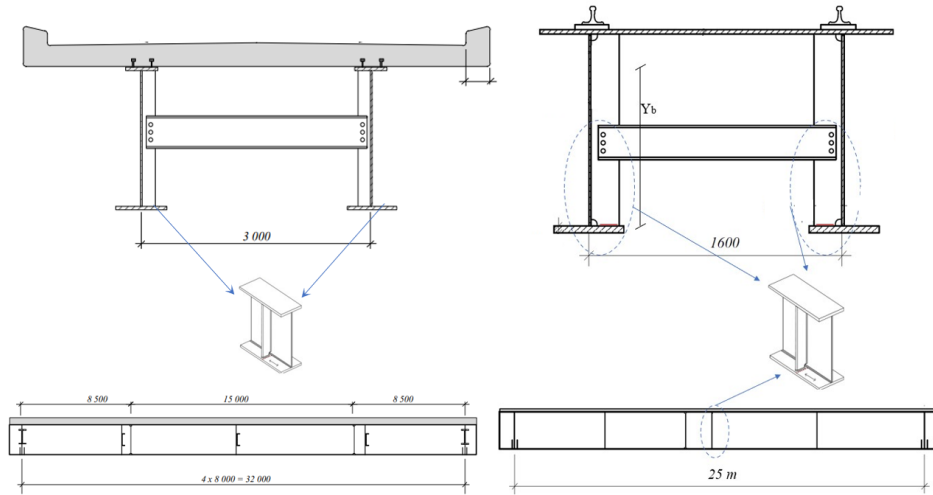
Cross-section and elevation views of the studied road and railway bridges
